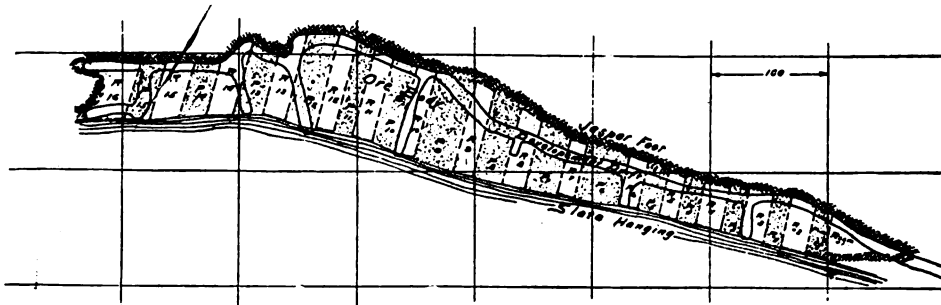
Plan Showing Development Drift and Outline of Rooms and Pillars.
